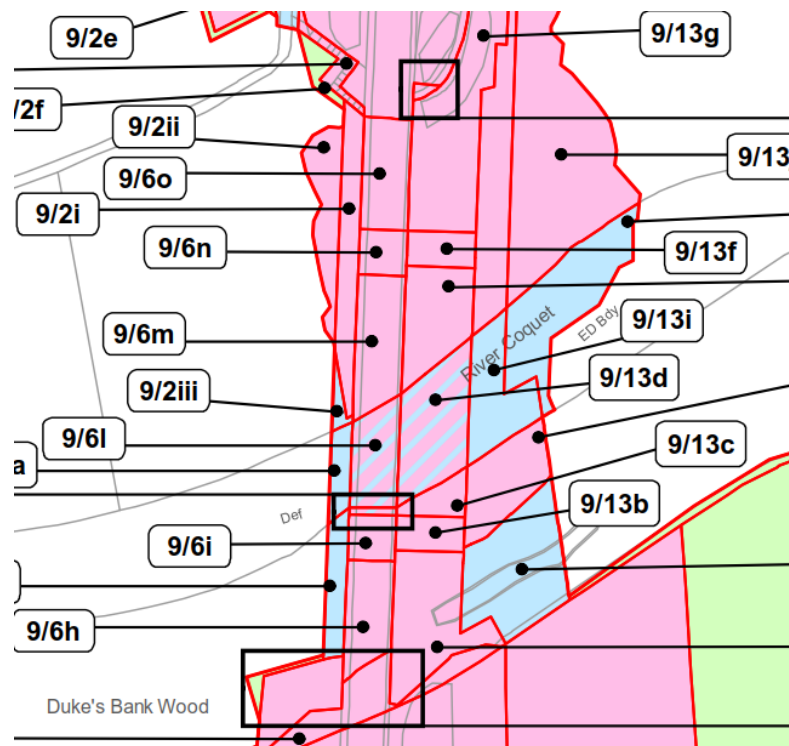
River Coquet bridge extract as illustrated in the Land Plans
